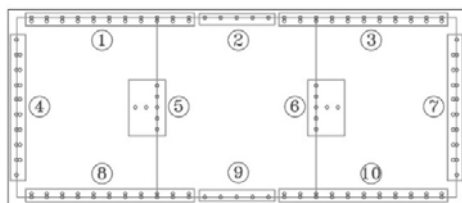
Distribution of rebars in the pier section of Shahid Bakri Bridge
